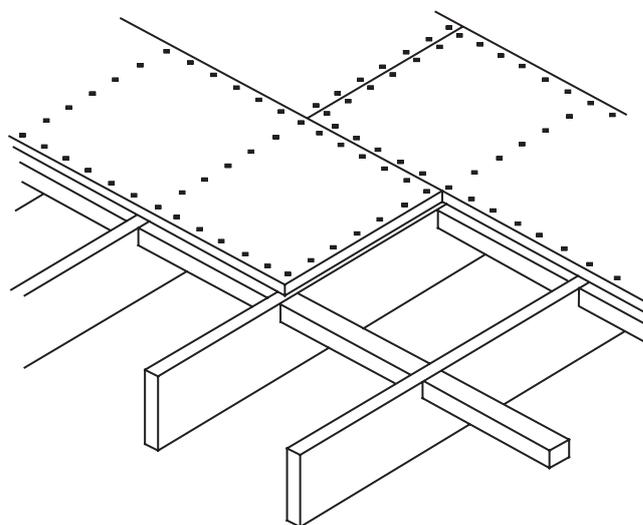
Square edge and structural decking laid across the joists and supported by noggings. Noggings are required to the long edges of square-edged panels
